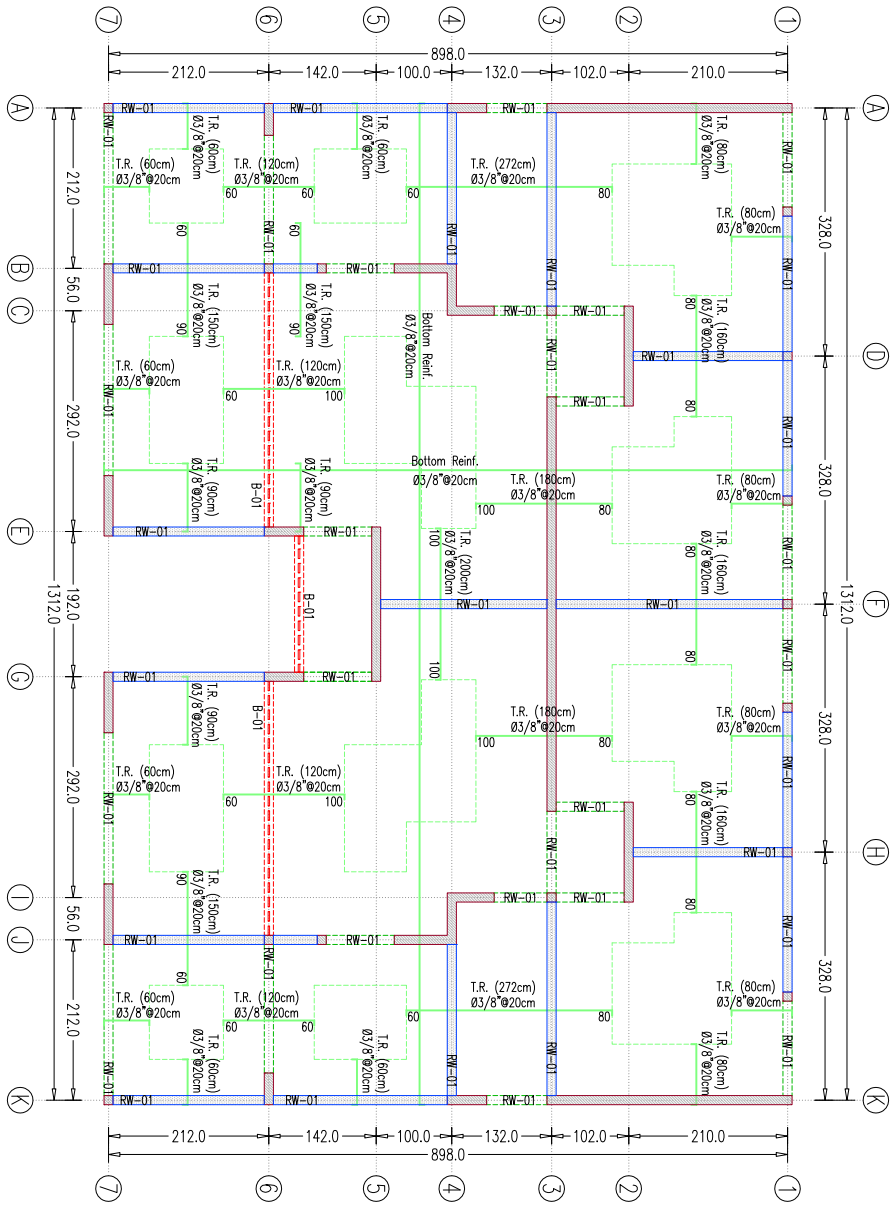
Structural Plan - Slab (Steel Reinforcement).
